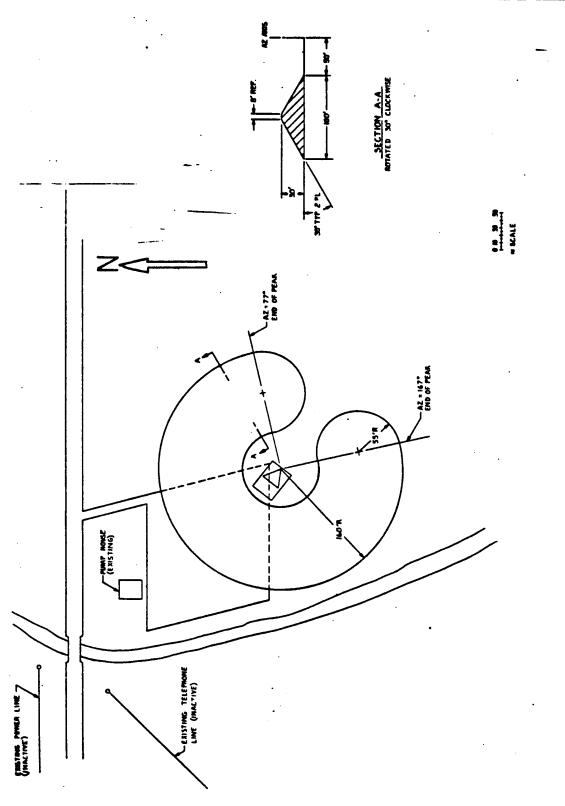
shows the general construction and arrangement of a 30-foot high earth berm with 25-foot tall trees will provide the required attenuation.
